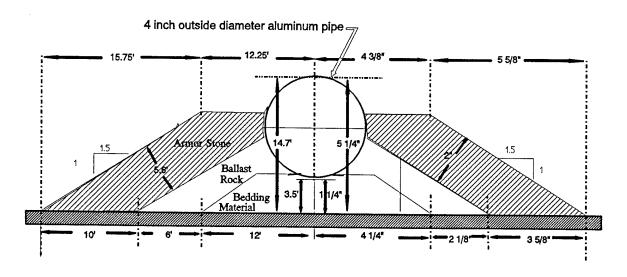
1:33.6 Scale Model Cross-section Showing Prototype and Model Dimensions
